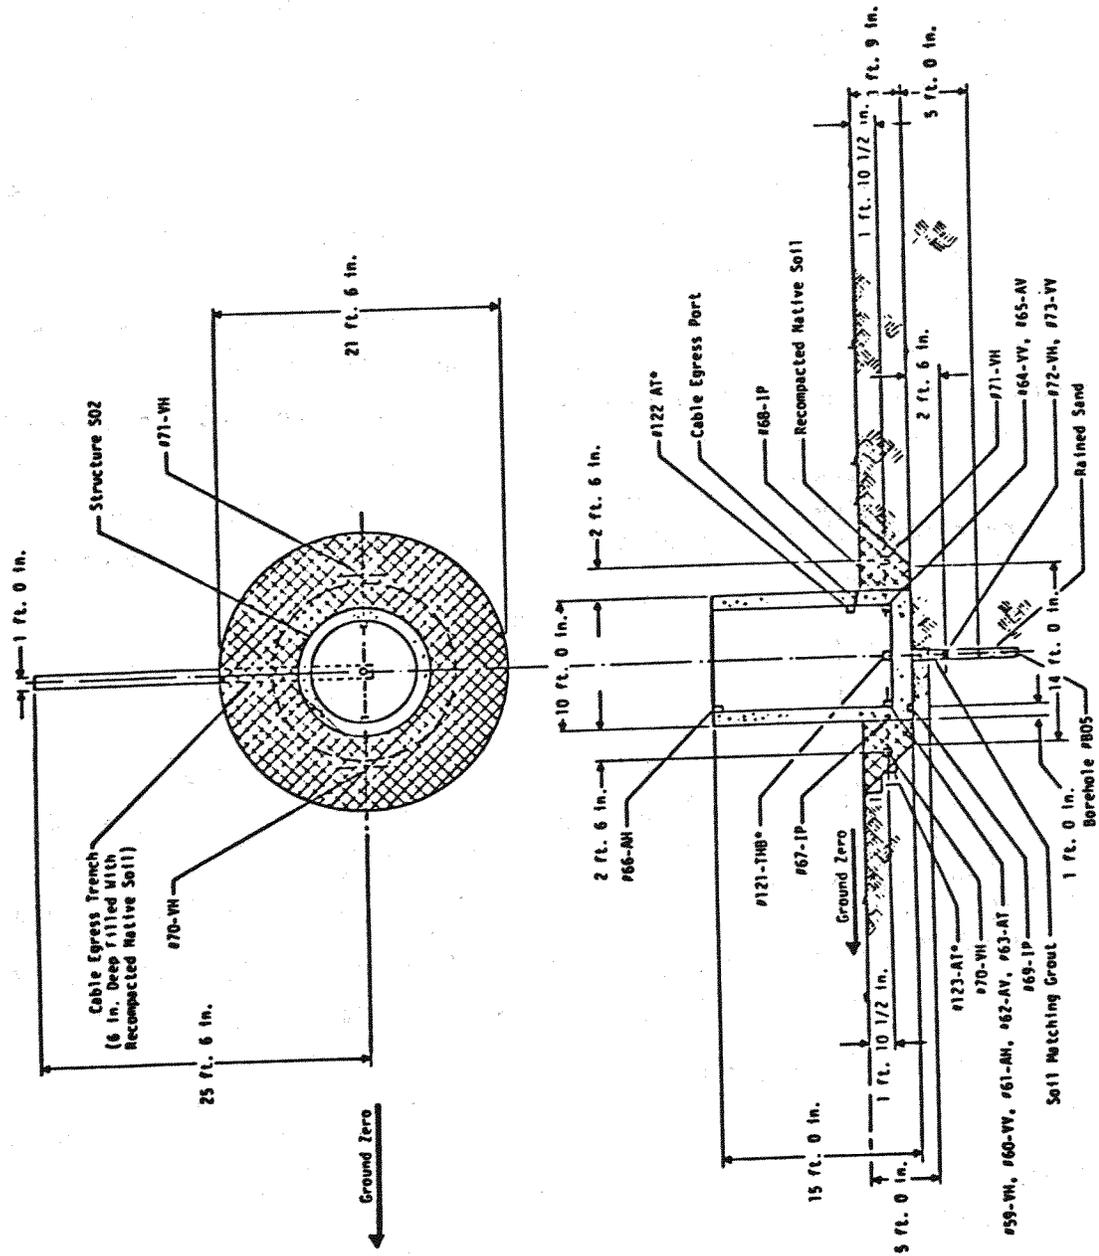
Configuration and Instrumentation Details for the 1/12 Size Structure (S01) in SIMQUAKE I.
